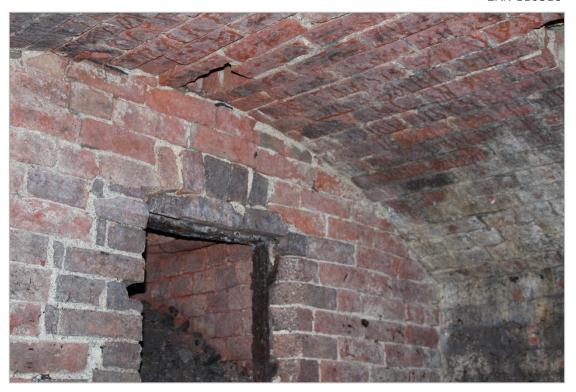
Photo showing the roof and west wall of the brick vaulted chamber of the underground boiler house to Glasshouse 1.
